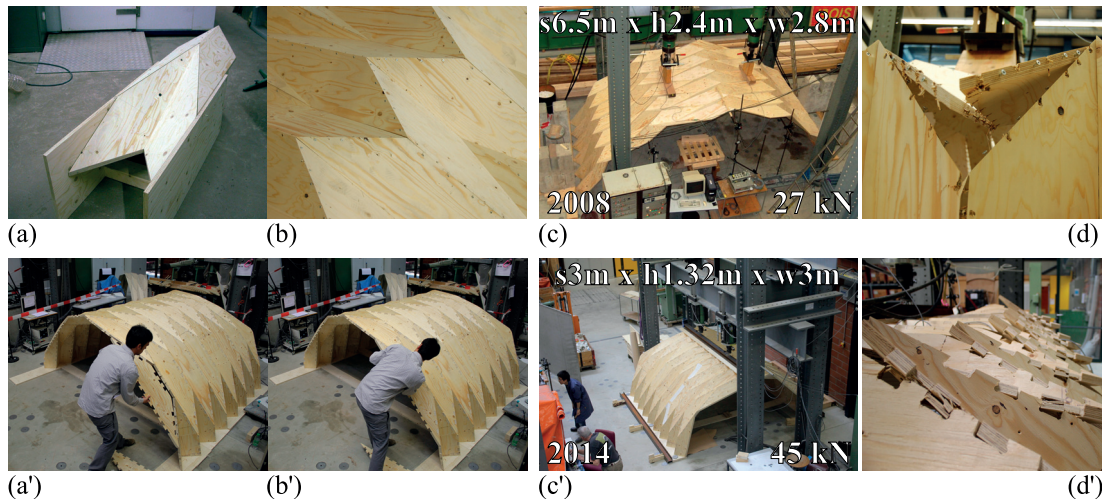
IBOIS FPS evolution : (a) Assembly rig for screwing, (b) Connections by $\phi 5 \times 80$ mm self drilling screw, (c) Load test on herringbone patterned shell, (d) Failure by tearing of screws, (a'-b') Direct 3D insertion of 3 non-parallel-edged panel, (c') Load test on Yoshimura patterned shell and (d') Multiaxial failure of dovetail connections.
